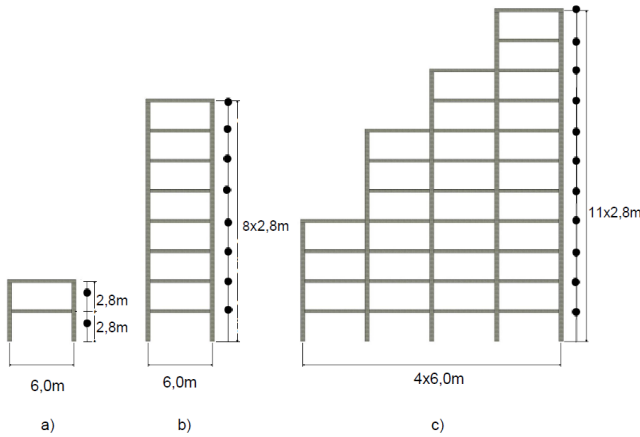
(a) Model A: two-floor building; (b) model B: eight-floor building; (c) model C: eleven-floor building
